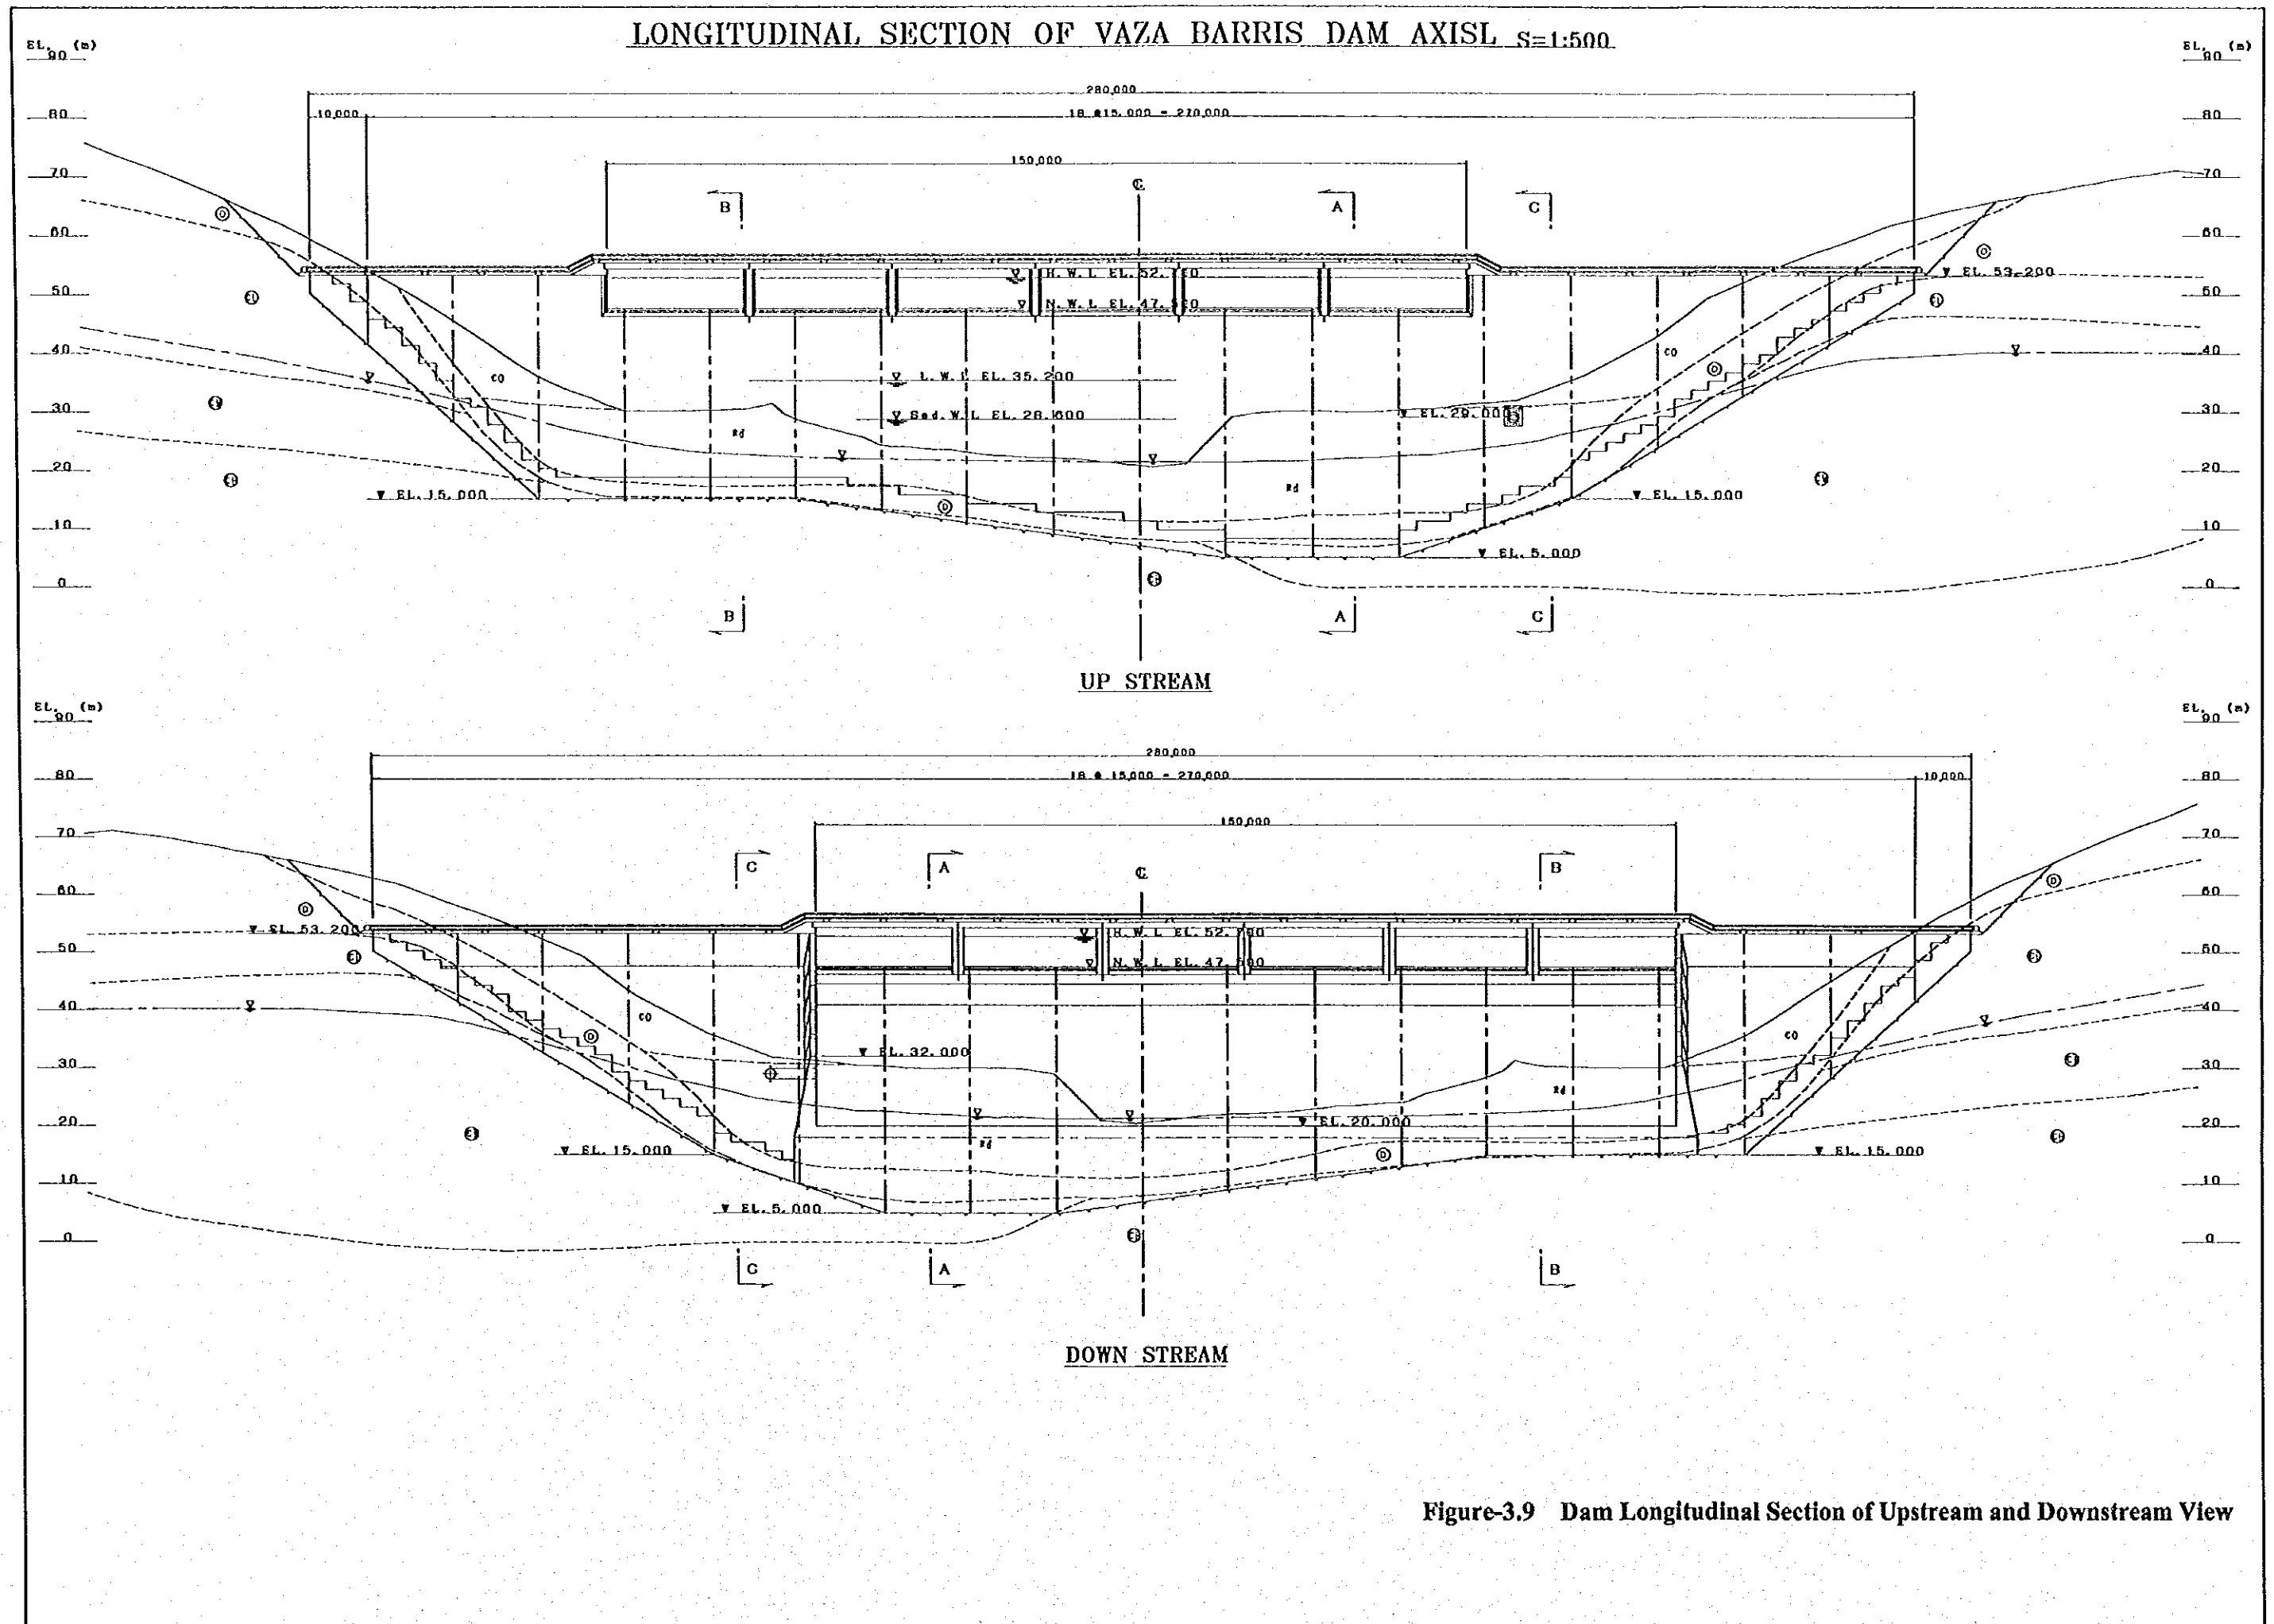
Dam Longitudinal Section of Upstream and Downstream View
